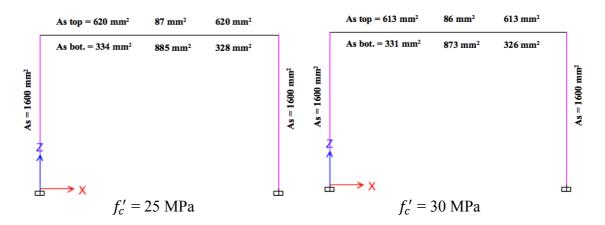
16: The effect of compressive strength of concrete on the steel reinforcement of frames
